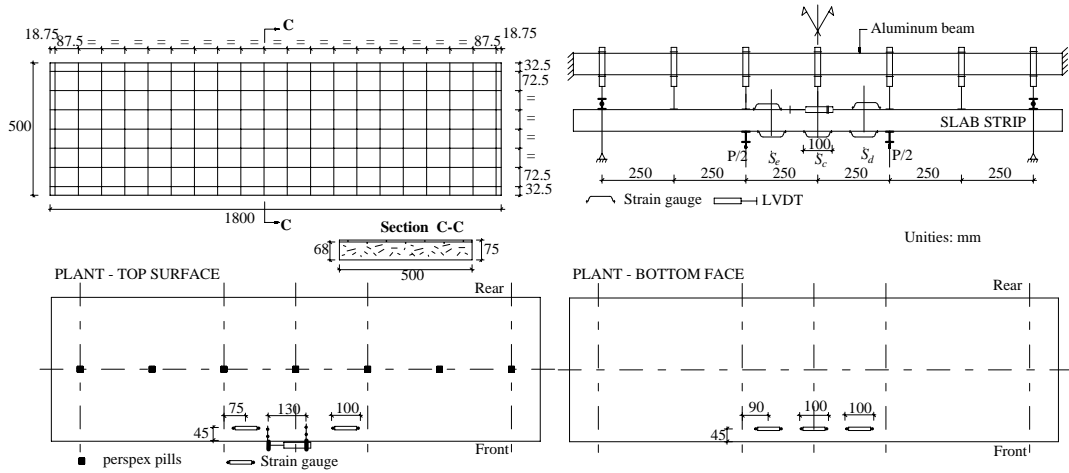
Slab strip geometry, support and load arrangement, and details of instrumentation
